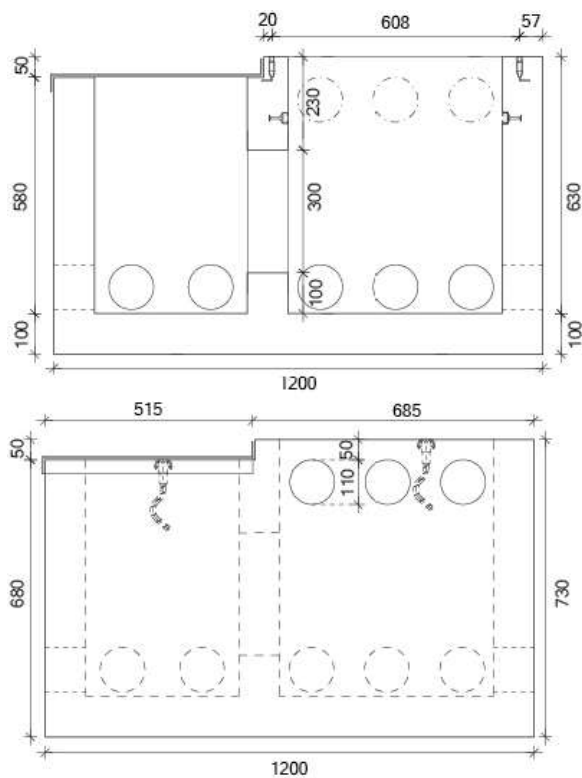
Indicative drawing for single cabinet's concrete foundation, top view (mm)
